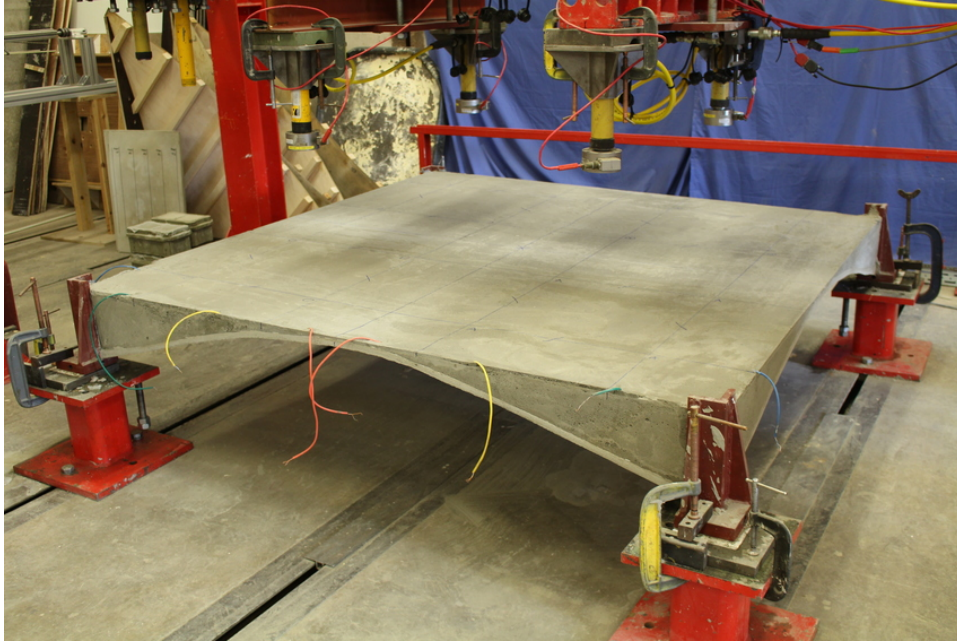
Prototype thin-shell textile-reinforced concrete floor system, University of Cambridge
